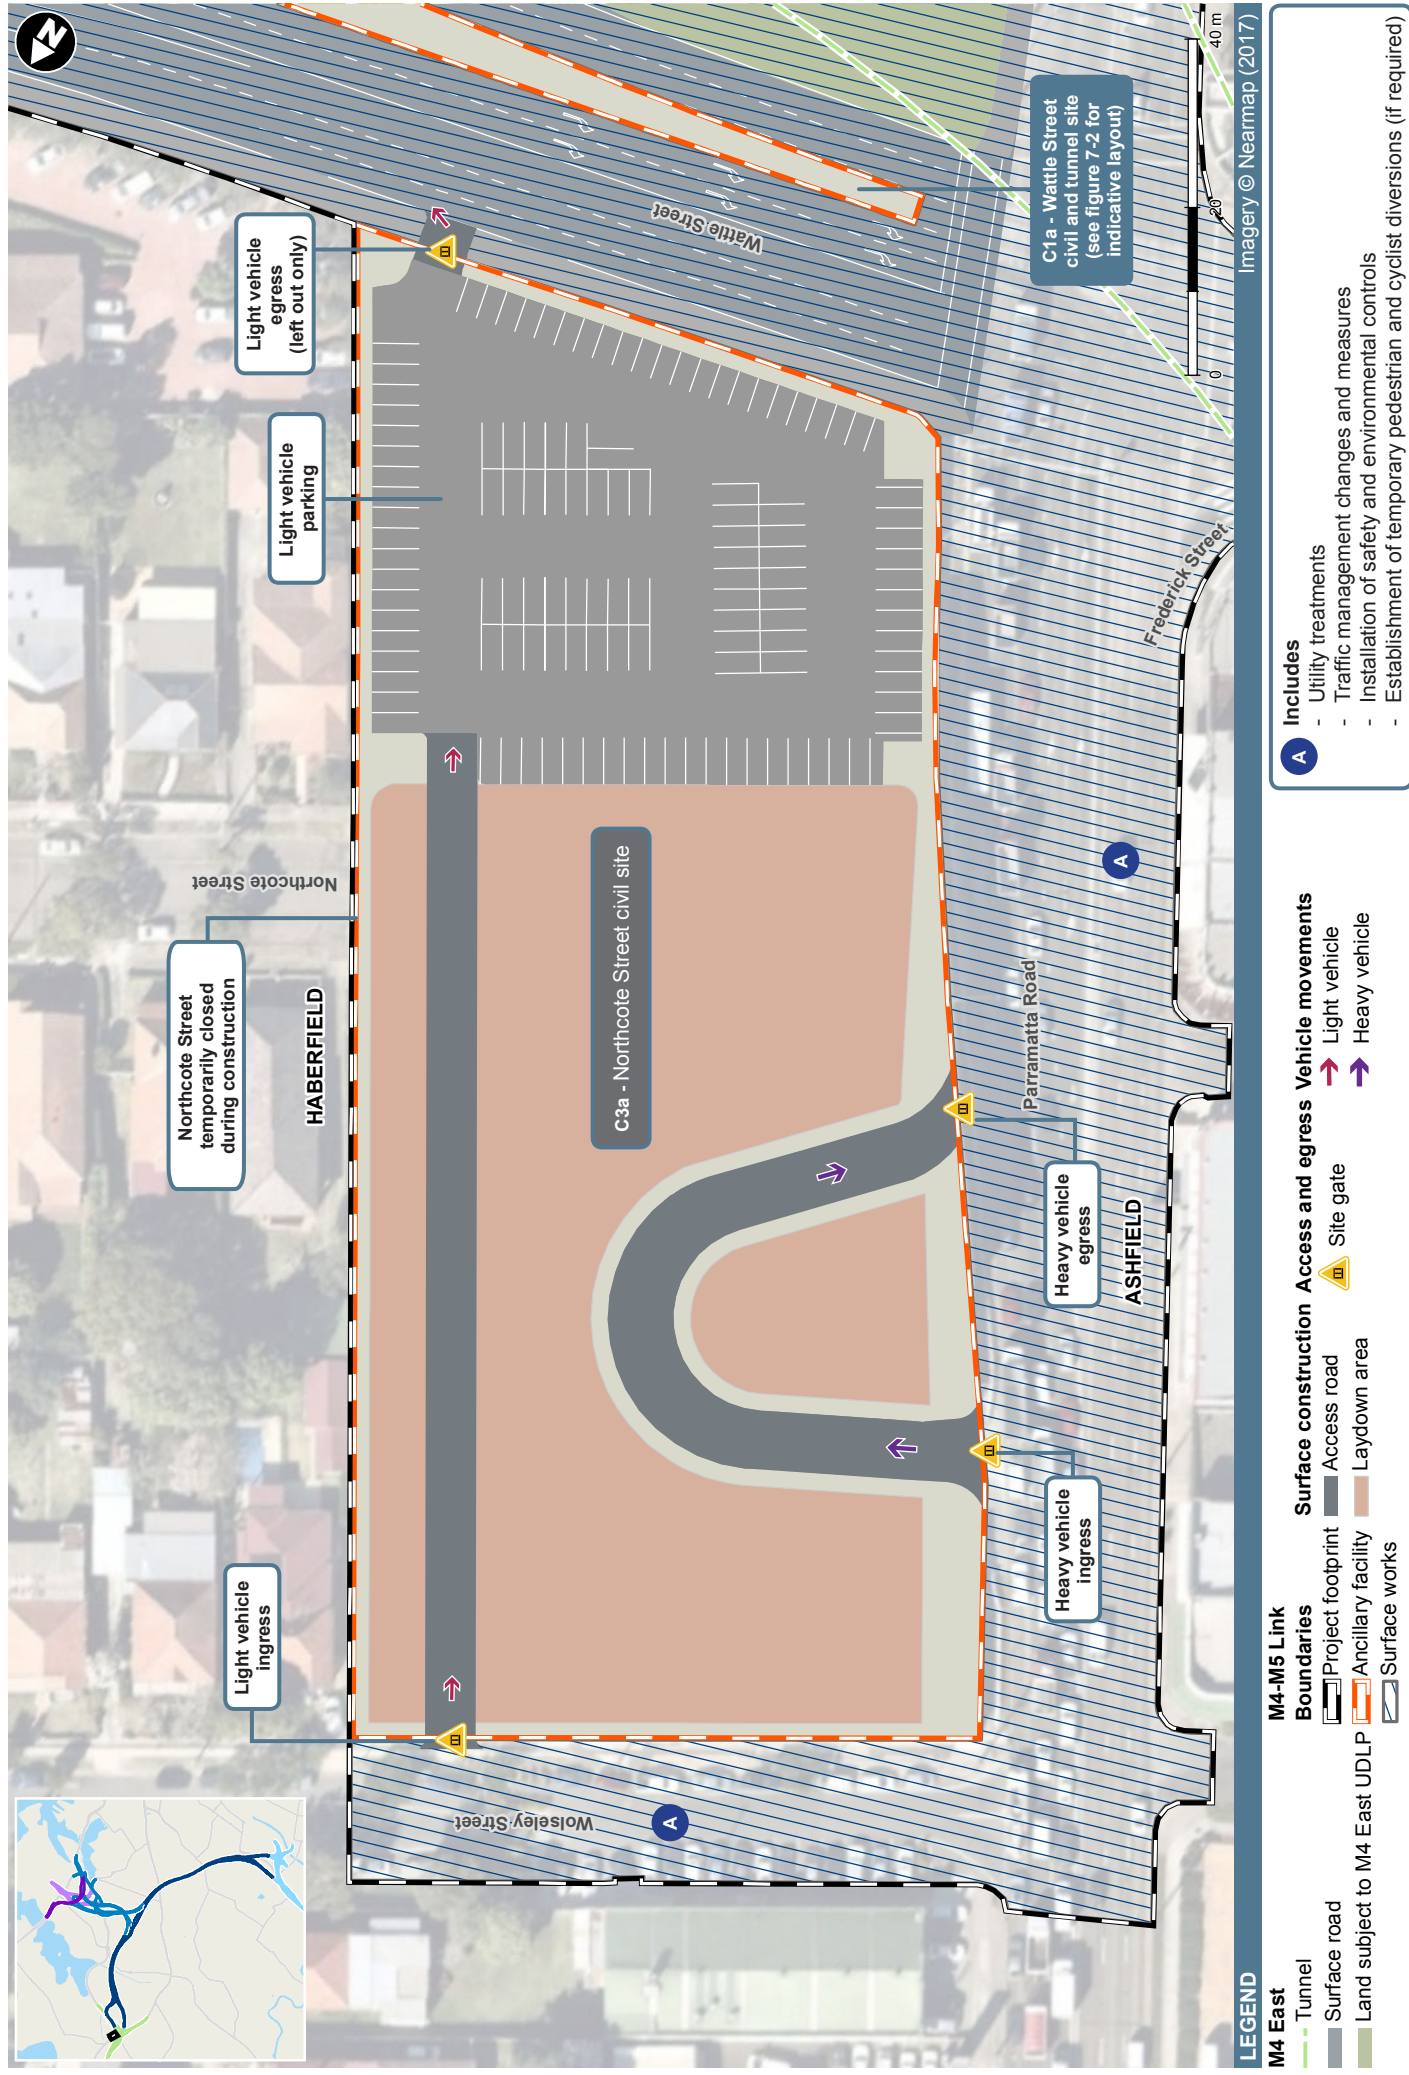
Indicative Northcote Street civil site (C3a) layout
